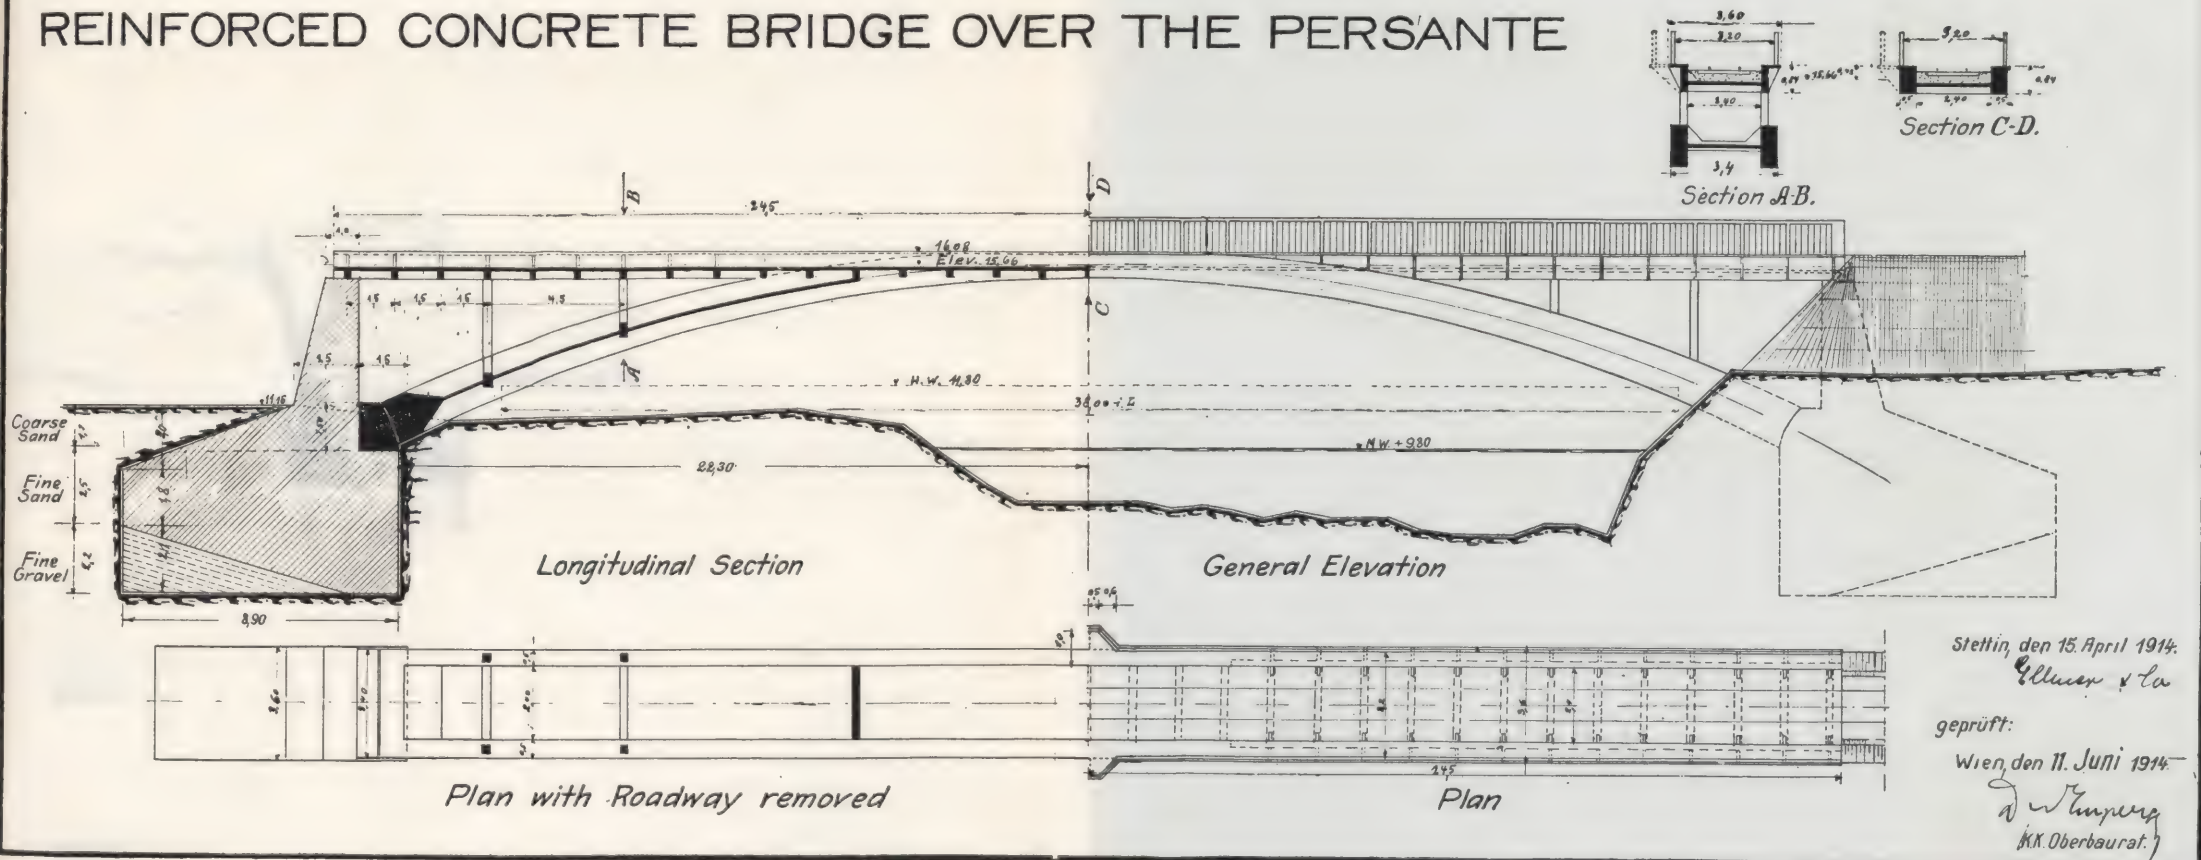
Plans for Bridge Over Persante River near Korlin.
